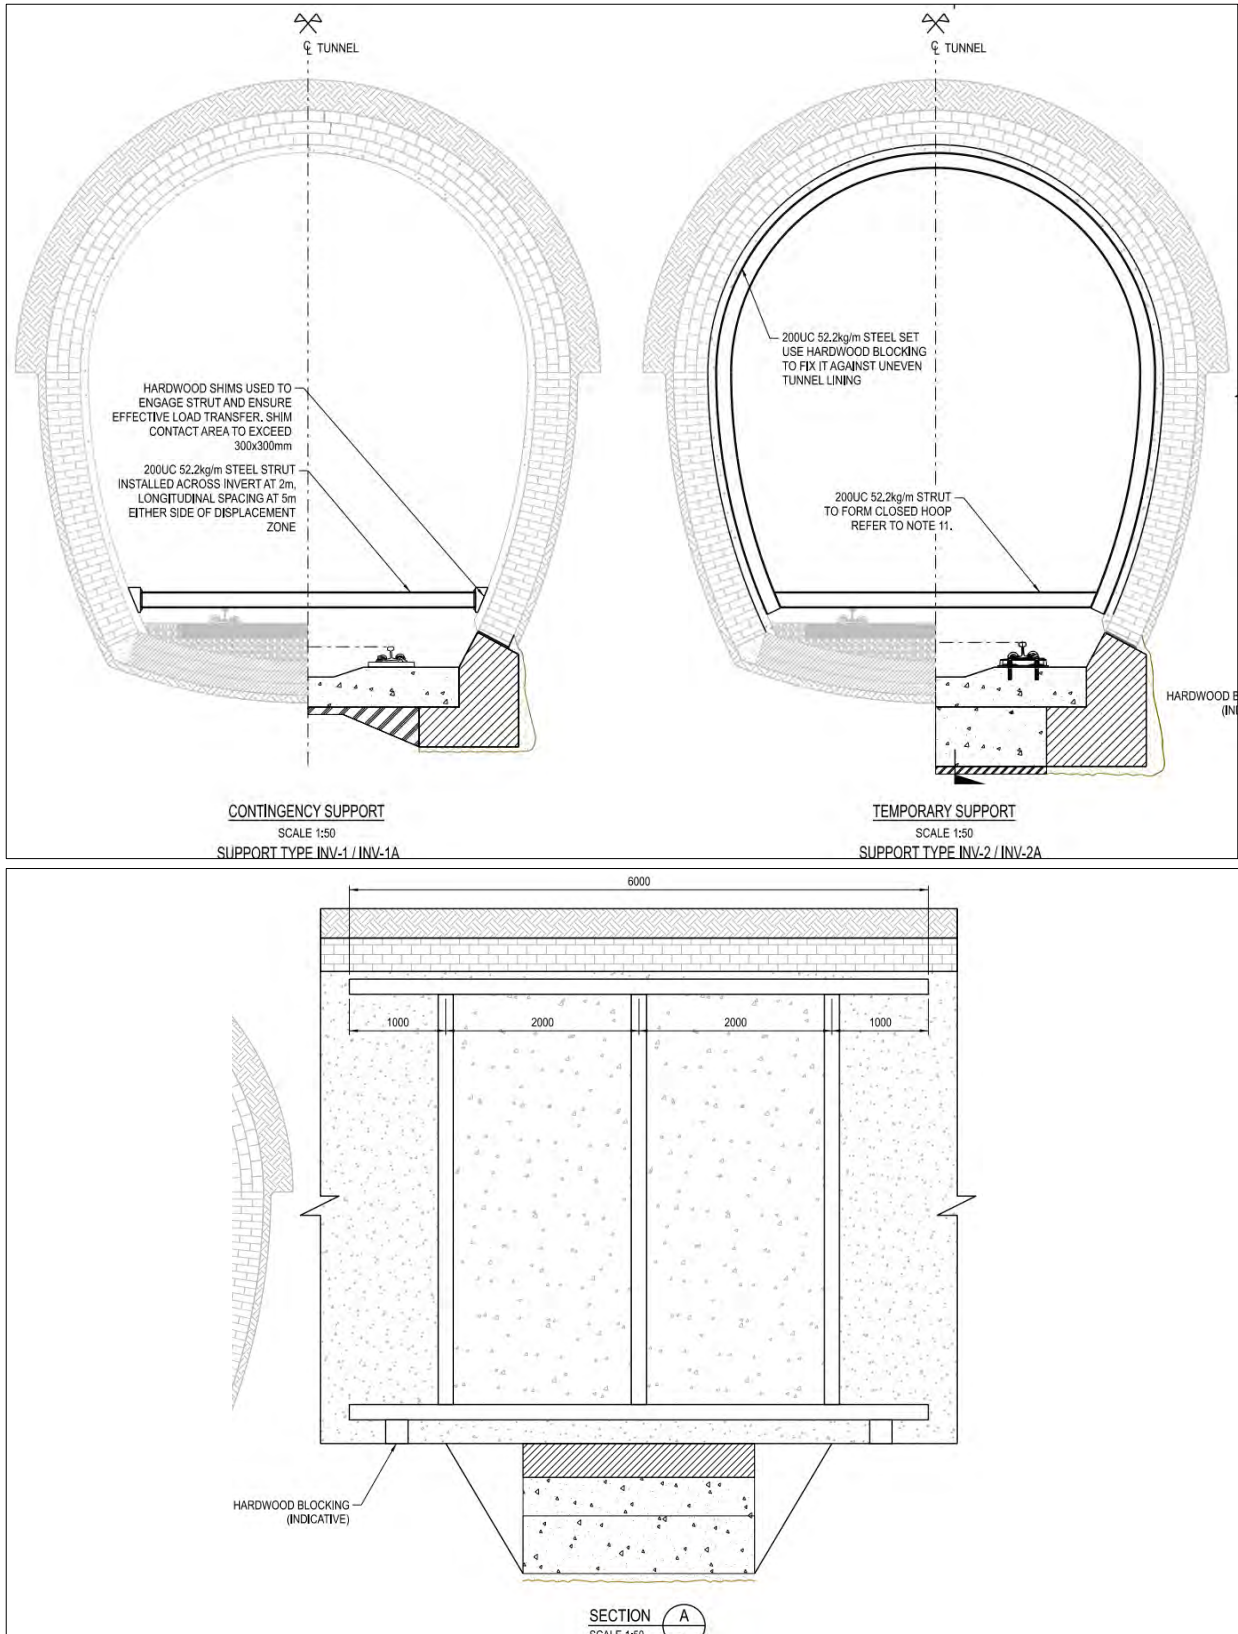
SECTIONS AND ELEVATION SHOWING PROPOSED CONTINGENCY MEASURES TO SUPPORT TUNNEL LINING. (SOURCE: AURECON/VLINE)
